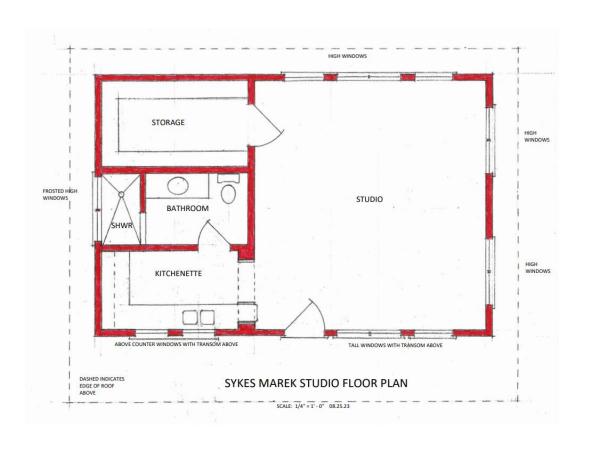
# EXHIBIT "F" FLOOR PLAN & ELEVATIONS
